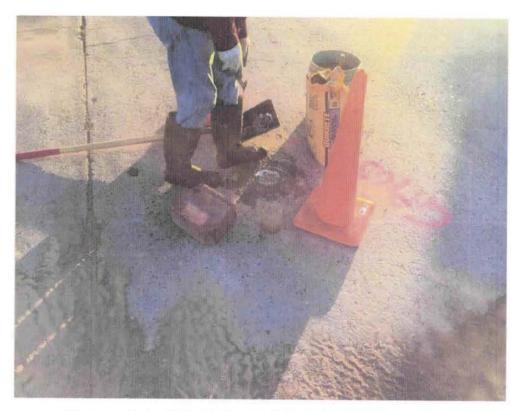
, view facing Northeast: GPRS surveying area for underground utilities.
